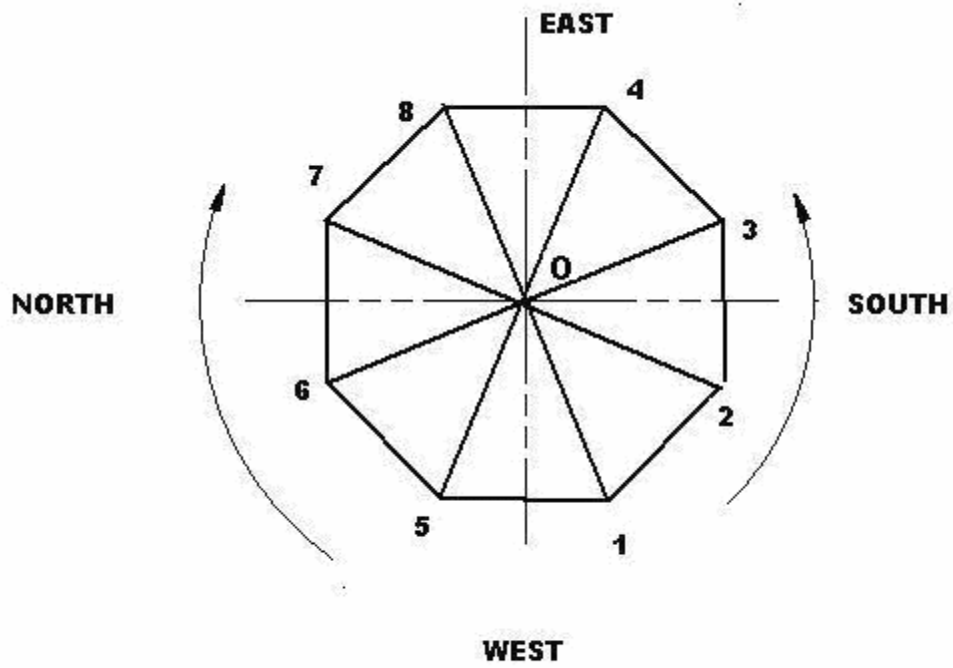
PLAN VIEW SHOWING LOCATIONS OF CAVES AND PASSAGE
